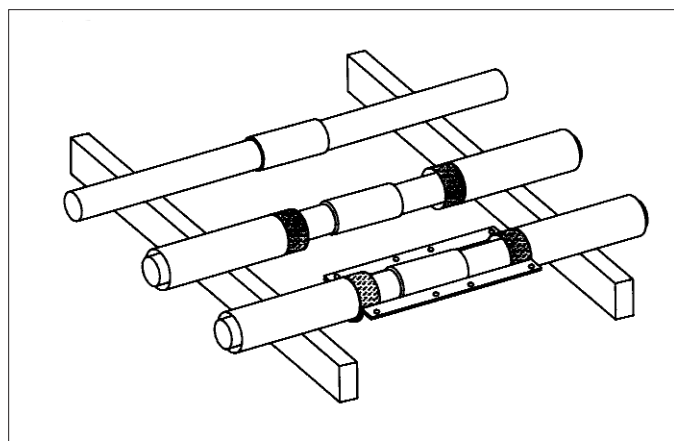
During layout, bonding and inspection, support the piping on 2x4 blocks to keep the joints clean and to keep bedding out of the pipe.
